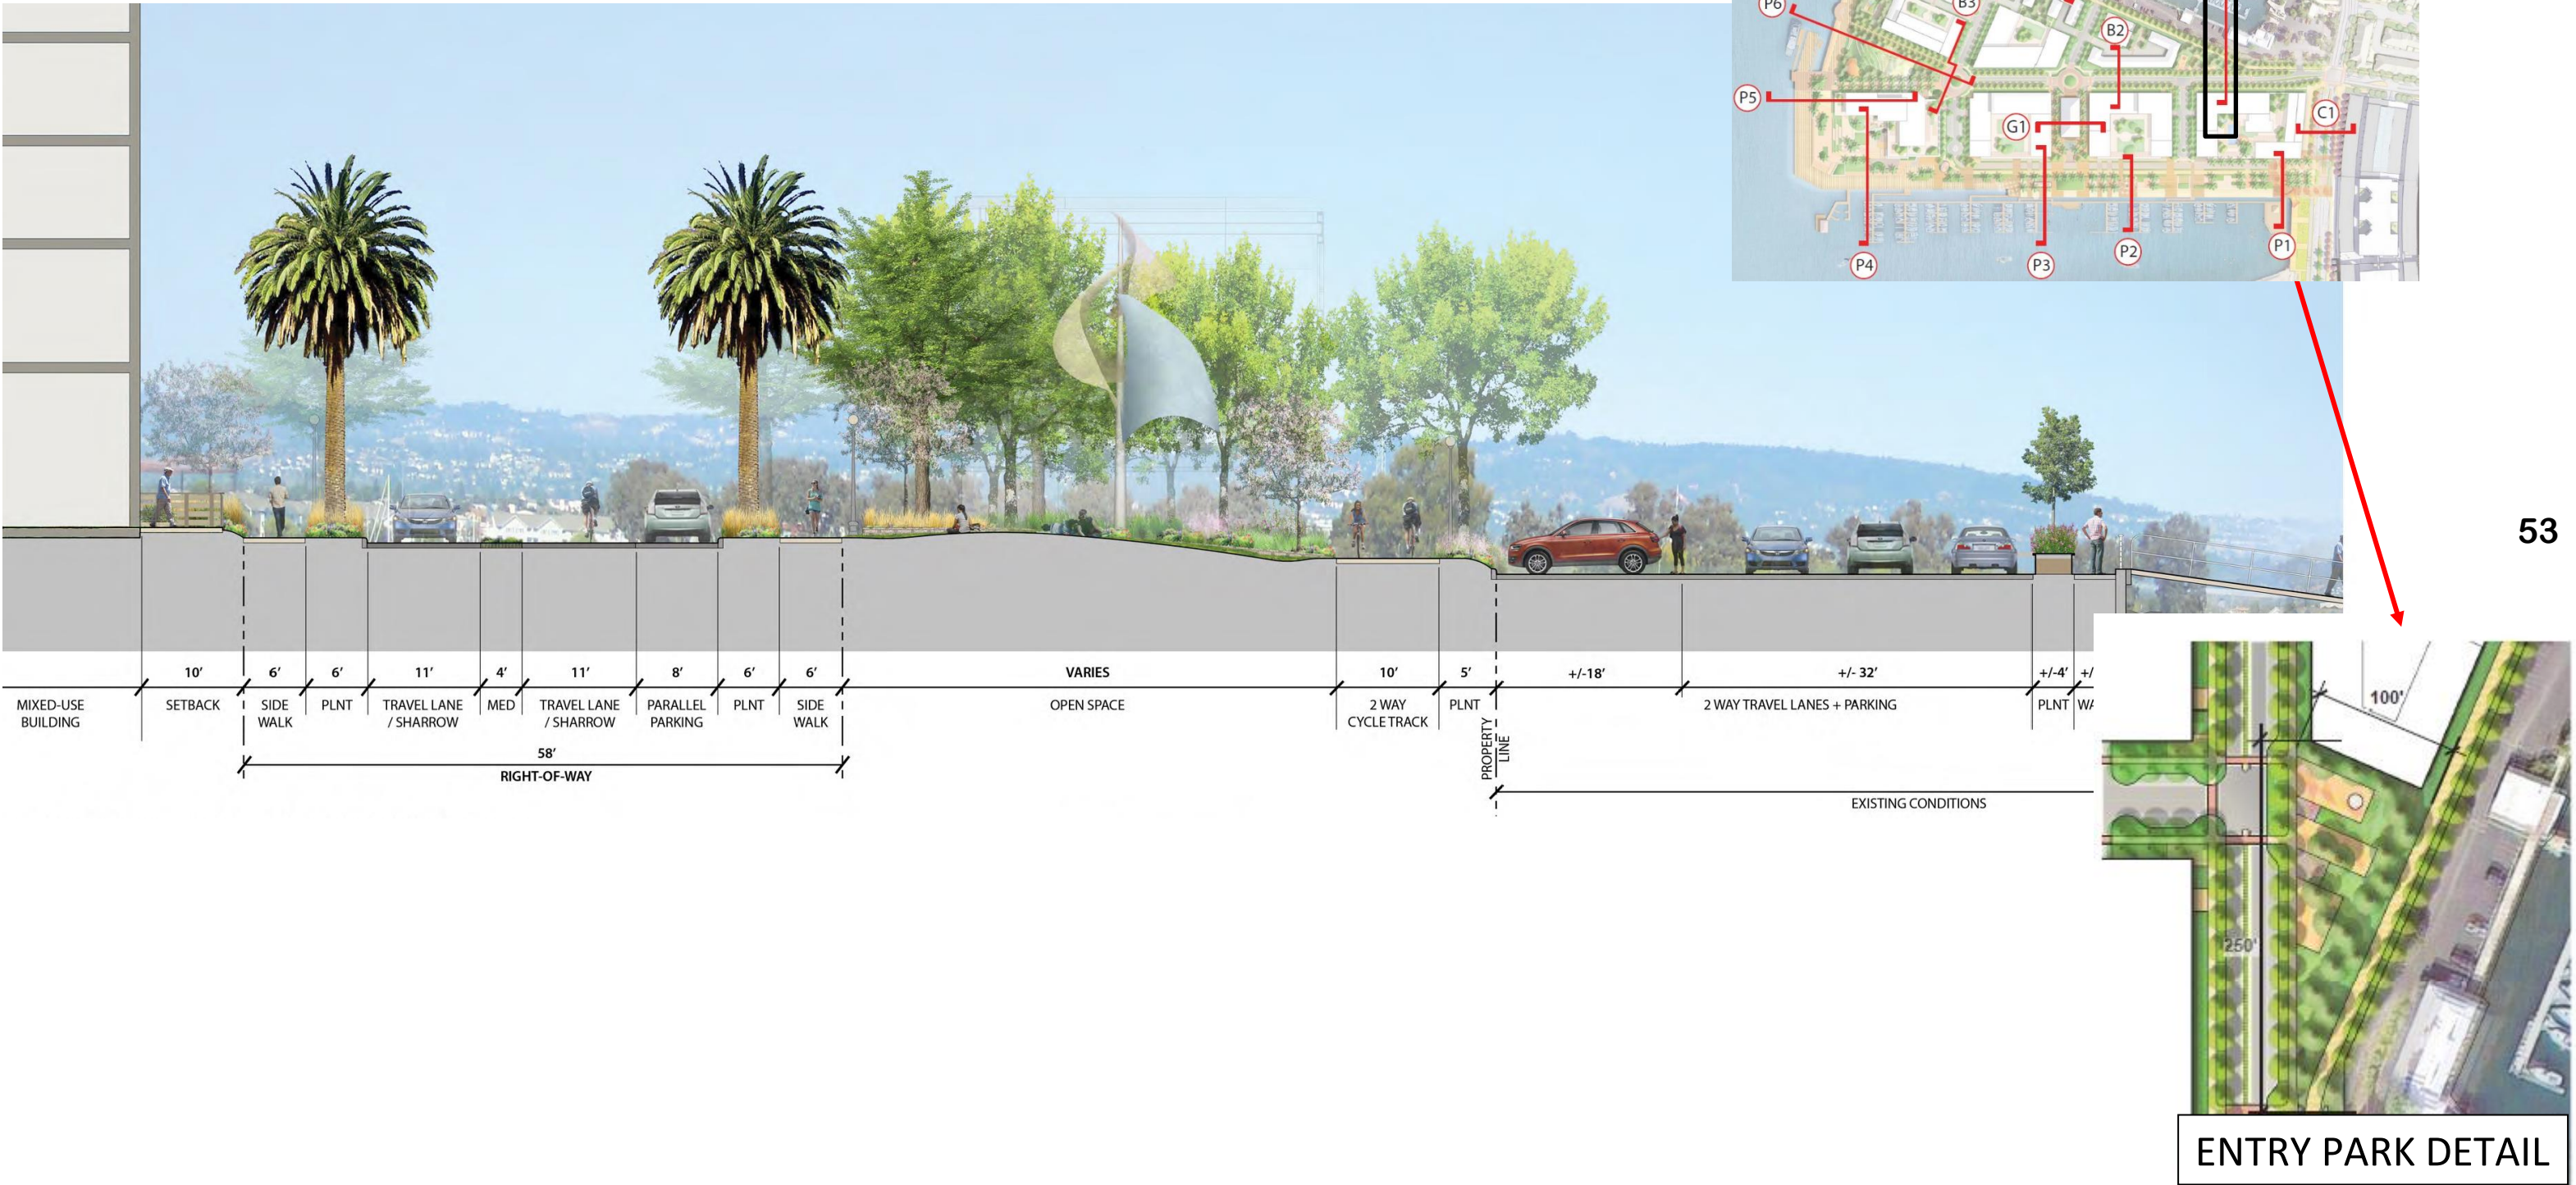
ILLUSTRATIVE CROSS SECTION B1: CENTRAL BOULEVARD (VIEW NORTH FROM CLEMENT AVENUE)
